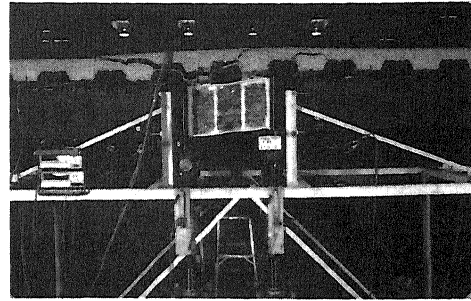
Floor Slab Damage, Specimen C1.
